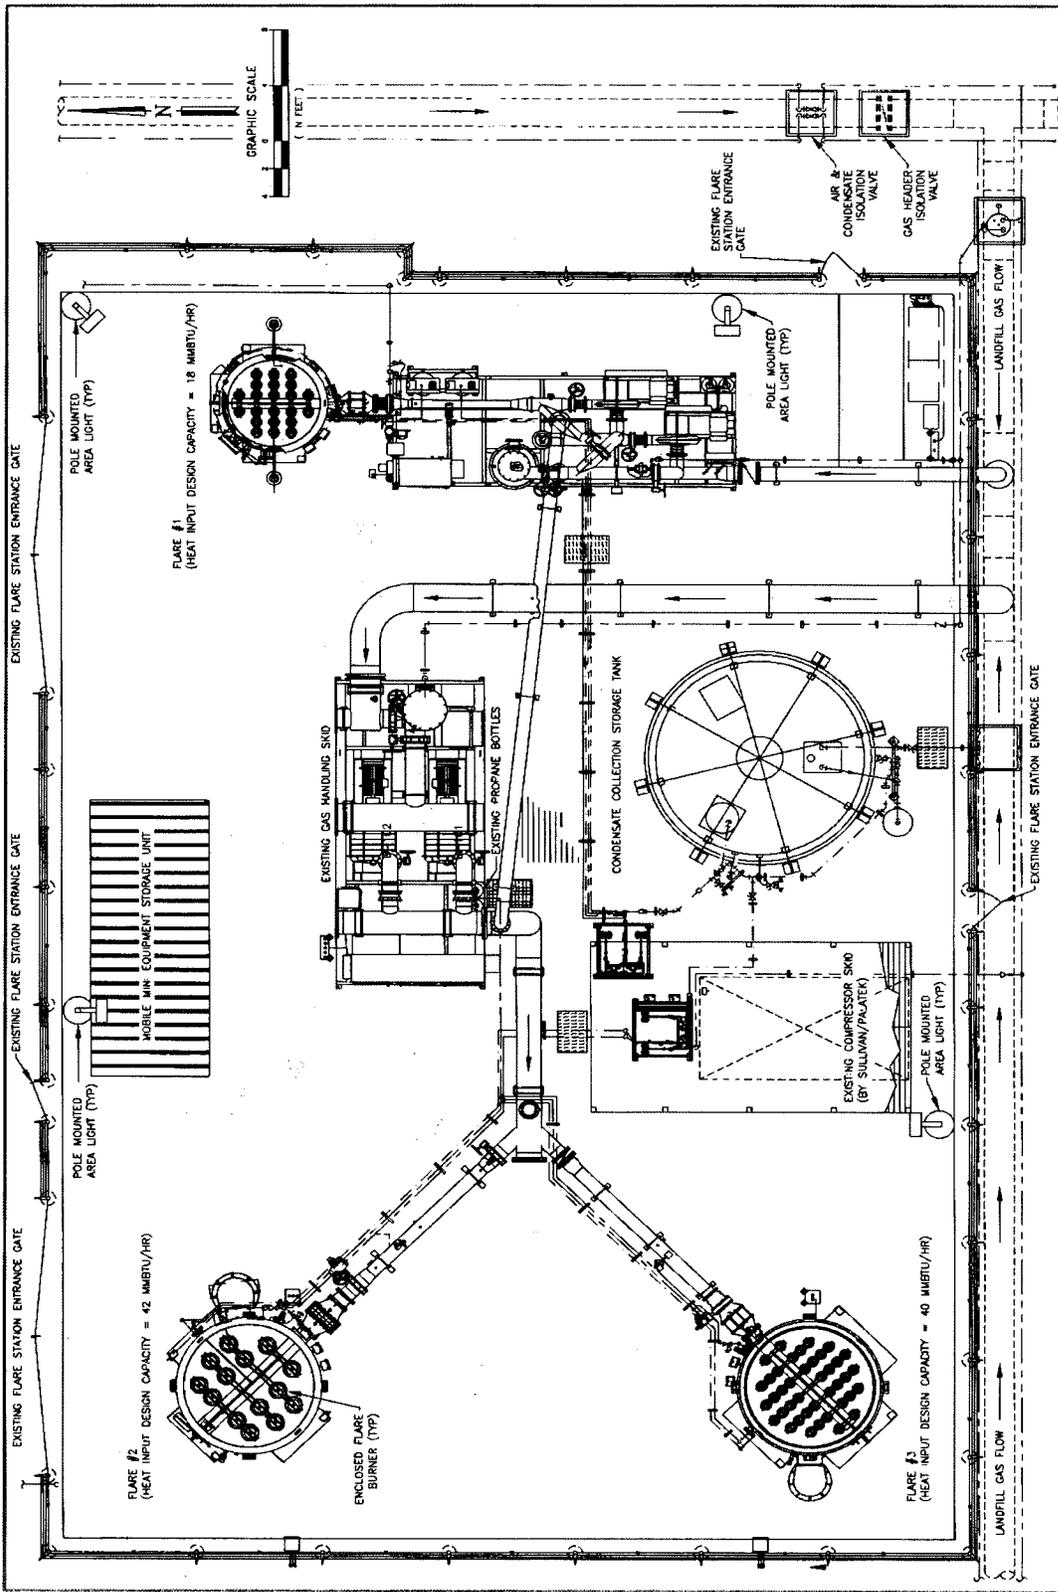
State Route 85 Landfill Flare Station Site Layout
